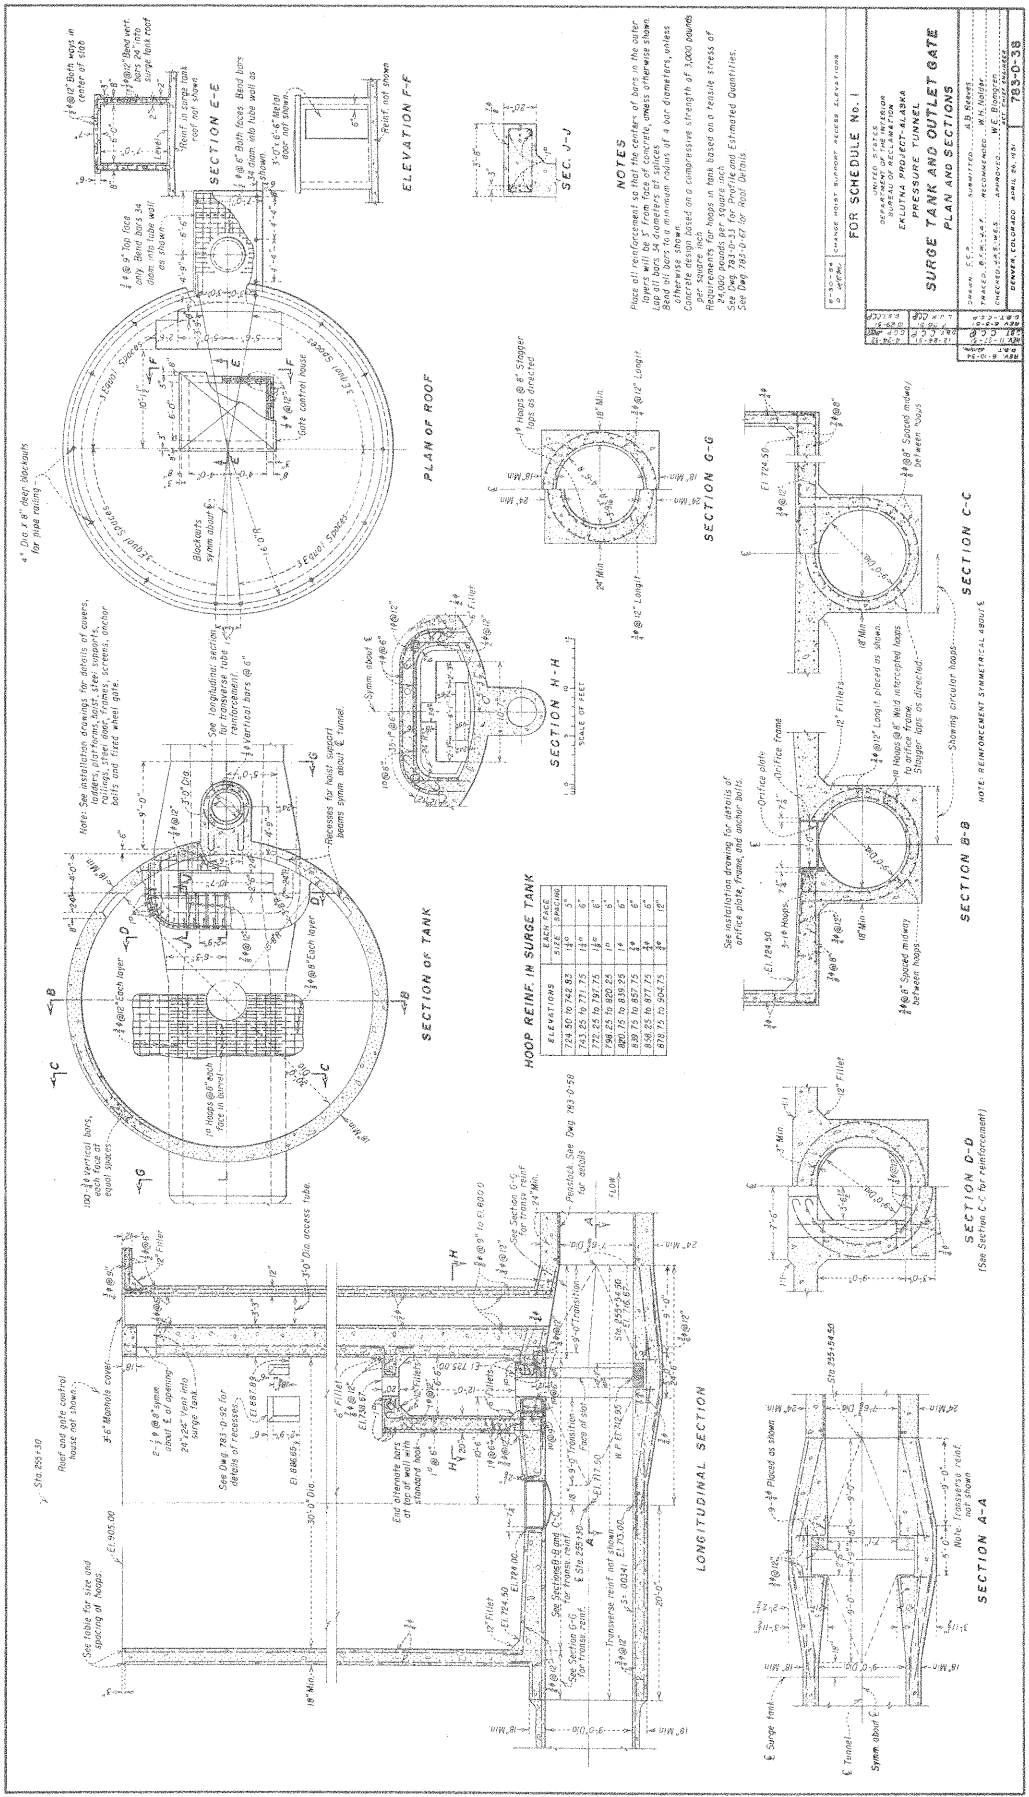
Plan and sections of surge tank and outlet gate for pressure tunnel.
